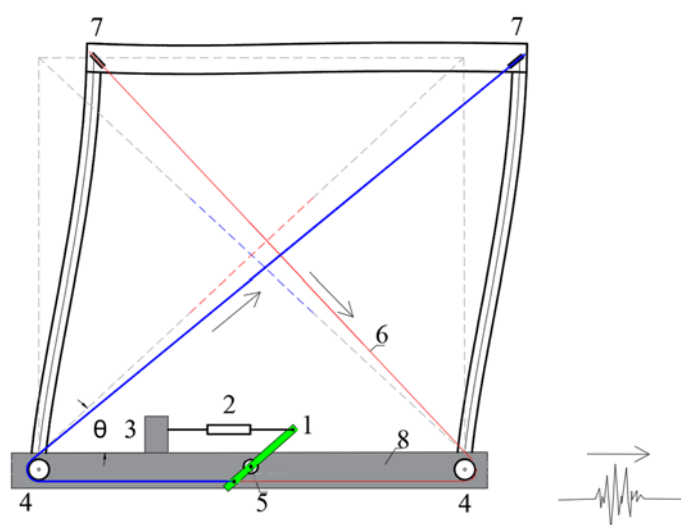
Conceptual model of simple 1-floor frame structure equipped with proposed system: 1 lever arm; 2 viscous damper (VD); 3 contrast; 4 pulleys; 5 pin; 6 wire; 7 clamp; 8 foundation.
